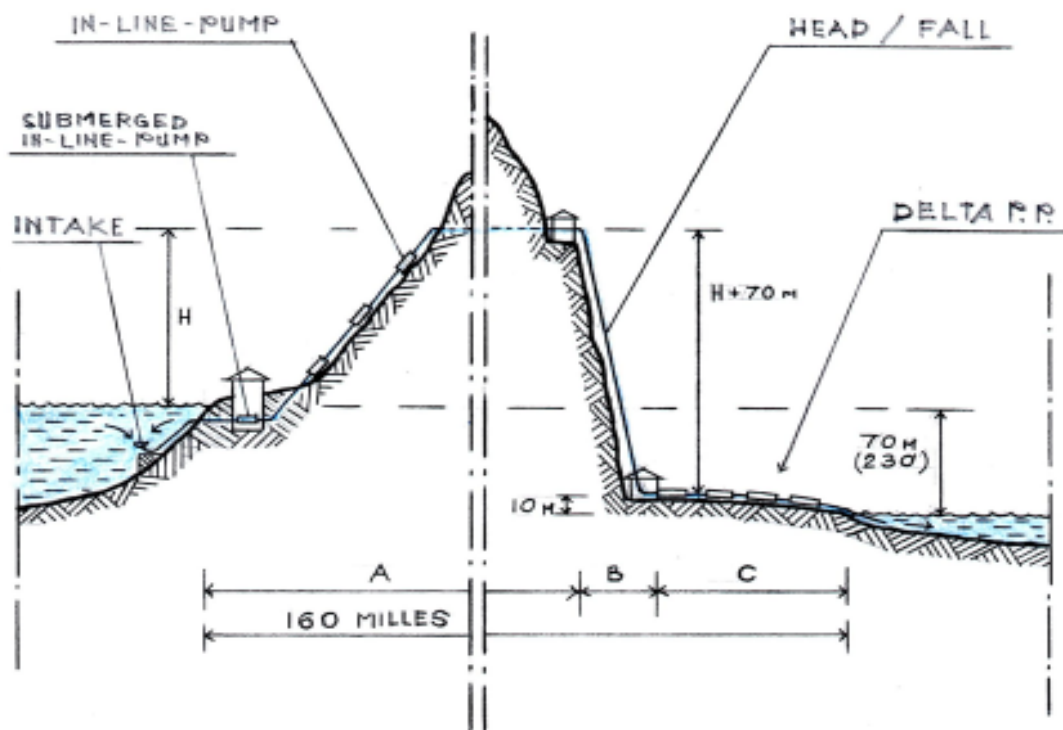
Cross-sectional View of Elevations of the Ocean and Salton Sea
